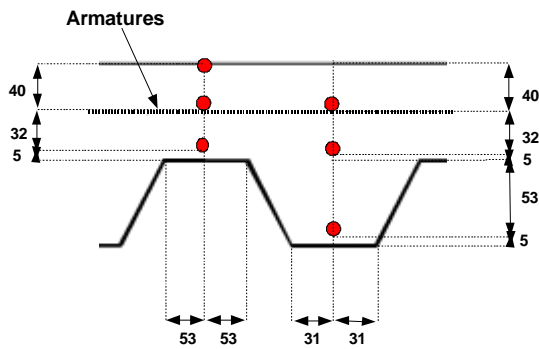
Typical cross section through composite slab showing thermocouple locations
